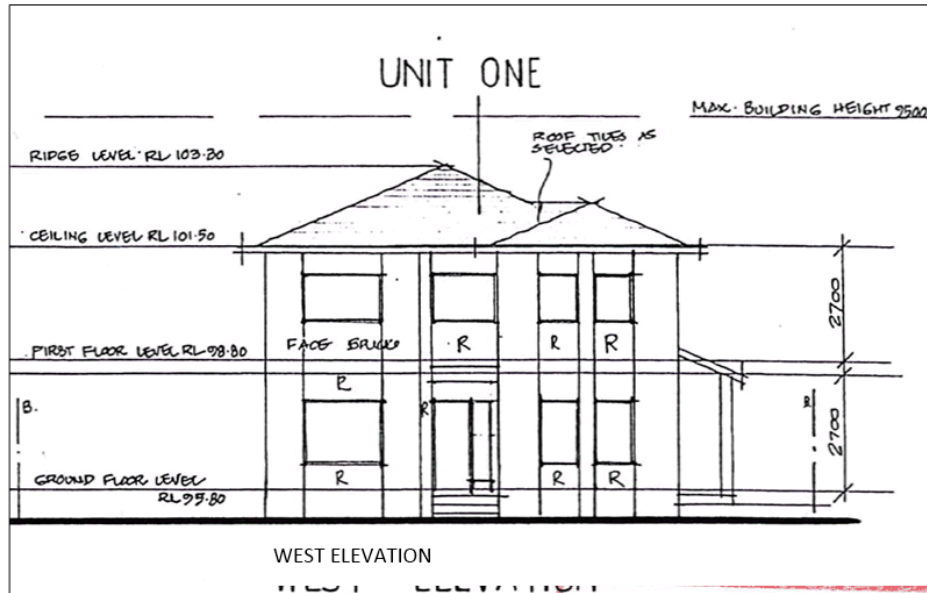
Proposed West Elevation (front) of 2 Waratah Street
